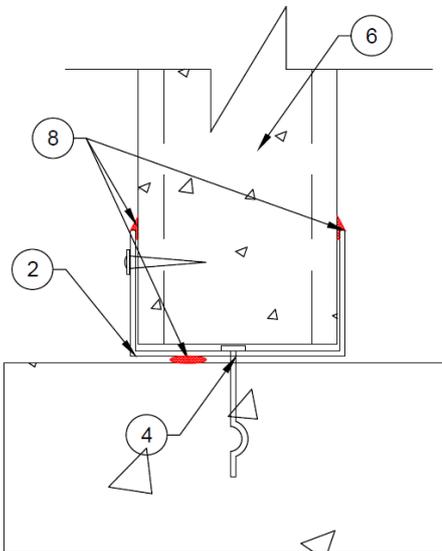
Bottom Detail for Vertical Speedpanel Wall
